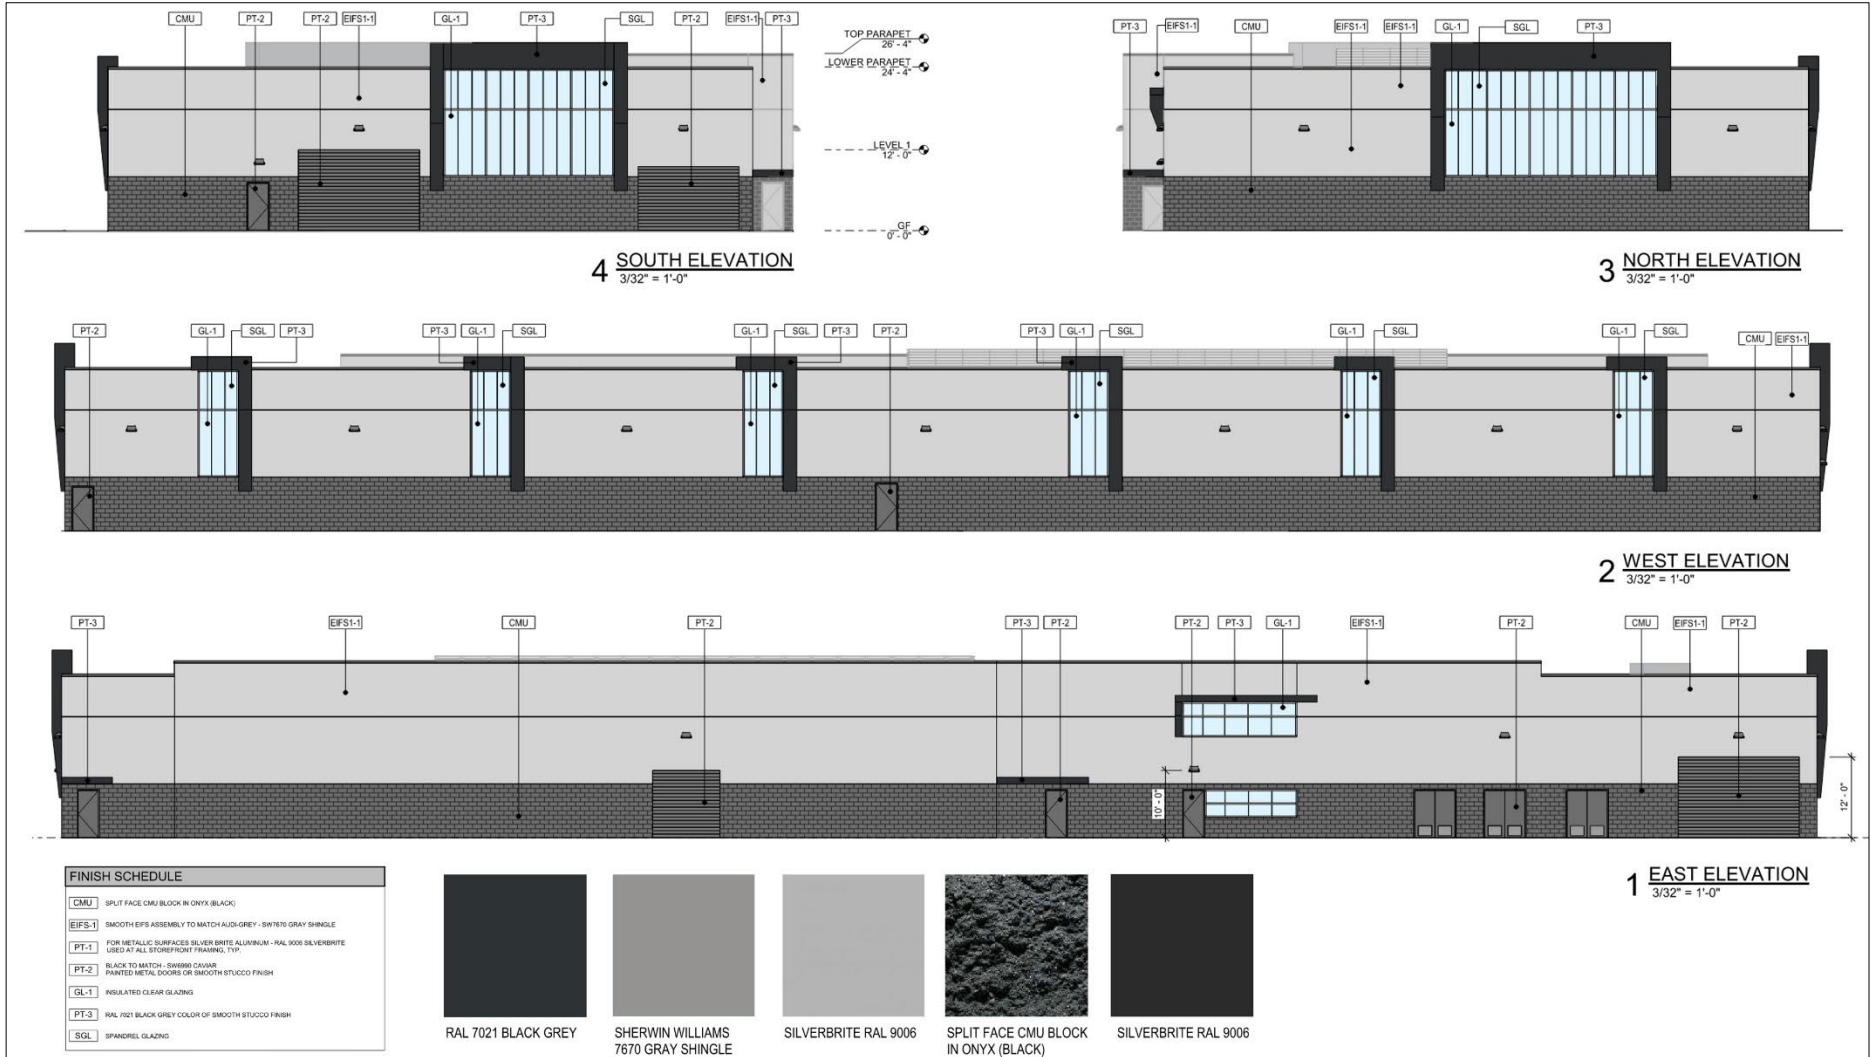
EXTERIOR ELEVATIONS – BATTERY STORAGE BUILDING
